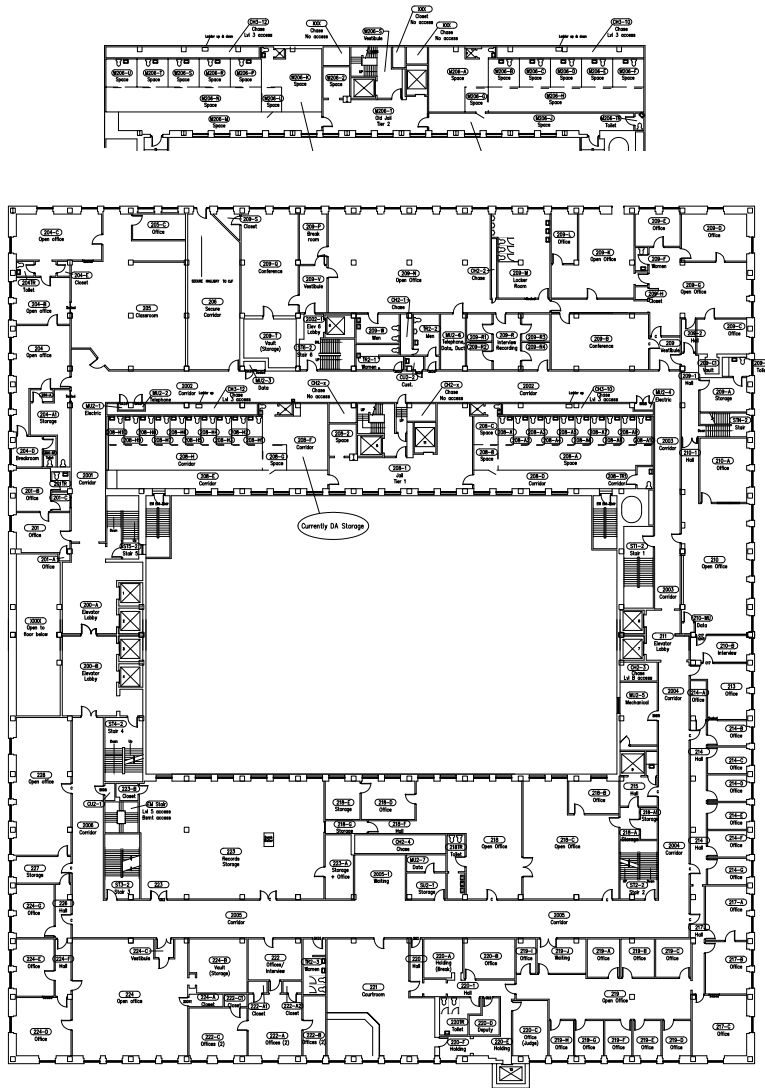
Typical Safety Building Floor Plan and Mezzanine Plan
